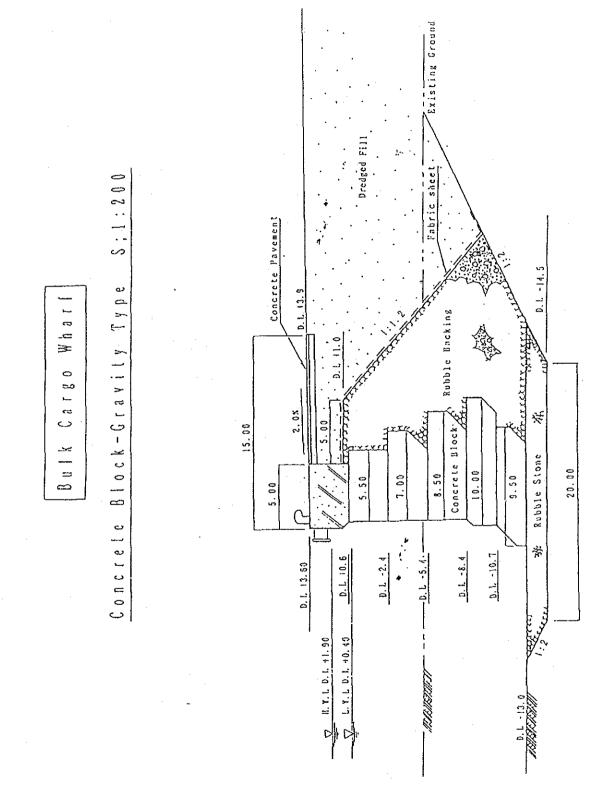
Gravity Type of Concrete Block for Bulk Cargo Quaywall
